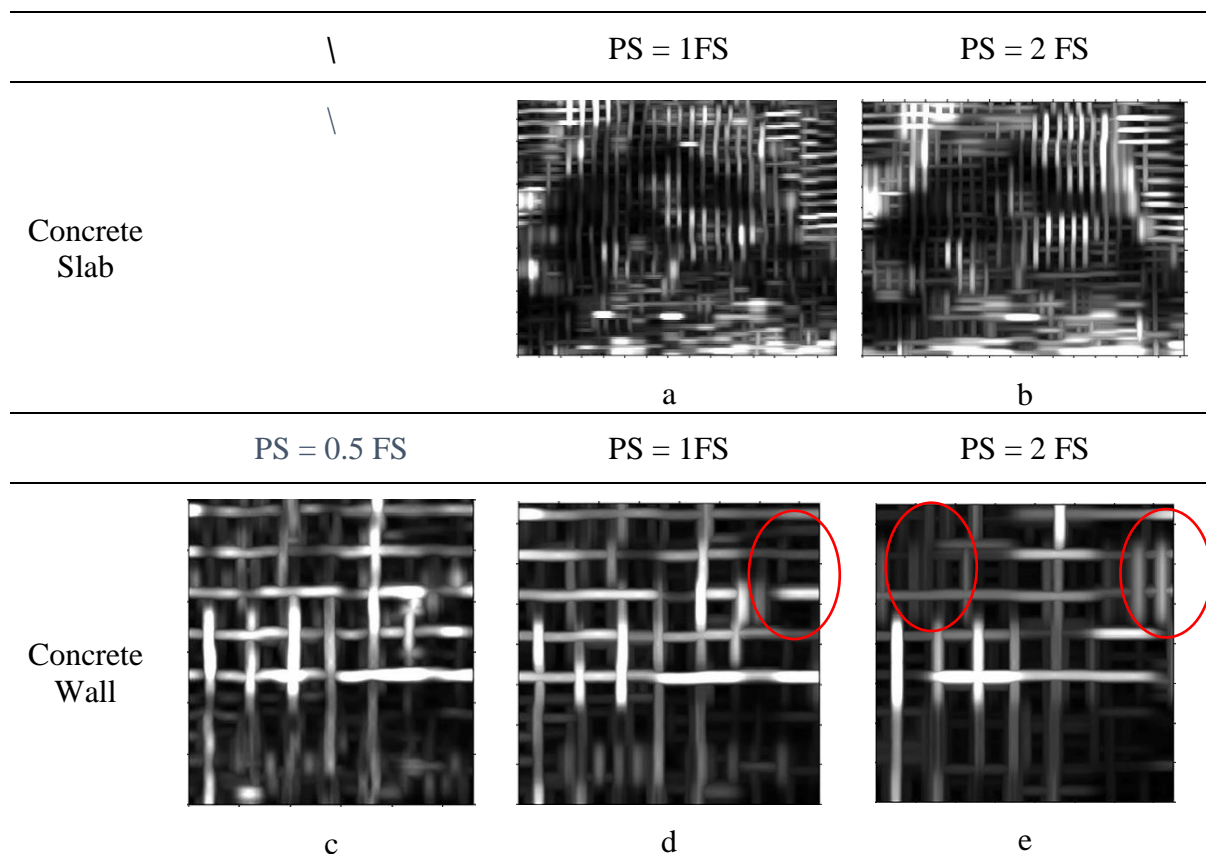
C-scans of concrete with different PS. (a) and (b) are C-scans of the concrete slab with the profile spacing equals 1 or 2 times the object spacing; (c)-(e) are C-scans of the concrete wall with profile spacing equals 0.5, 1 or 2 times the object spacing.
